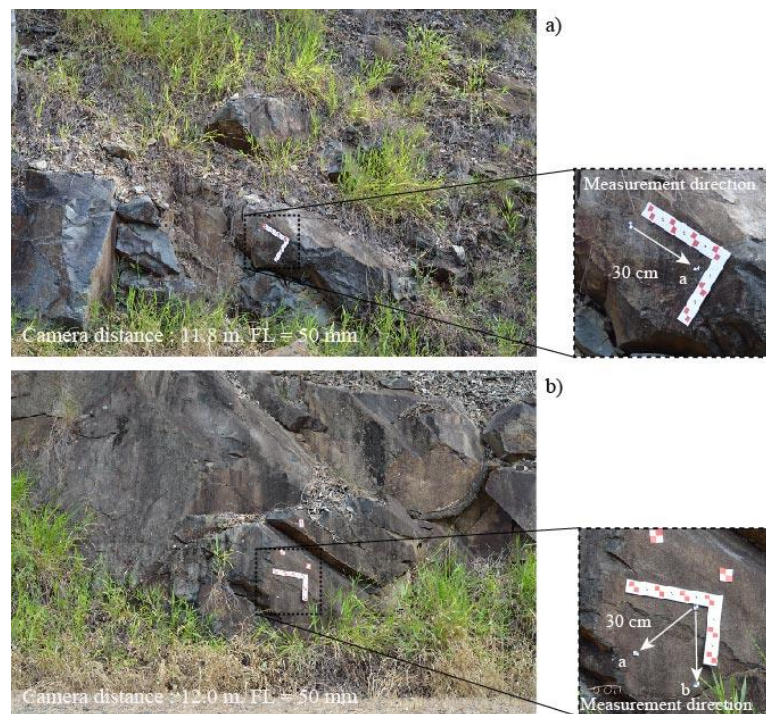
Study slope and measurement section; section a (a), section b (b) (site #2. Nerang-Murwillumbah road 2)
